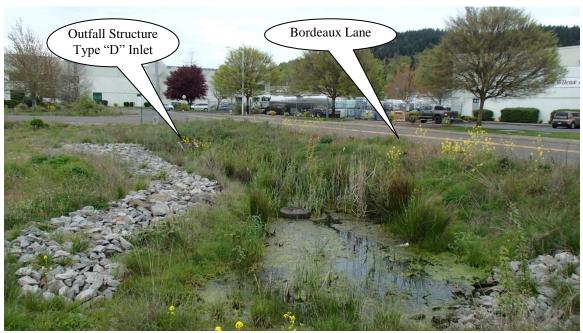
a view of extended detention pond facility, looking North toward Bordeaux Lane.
